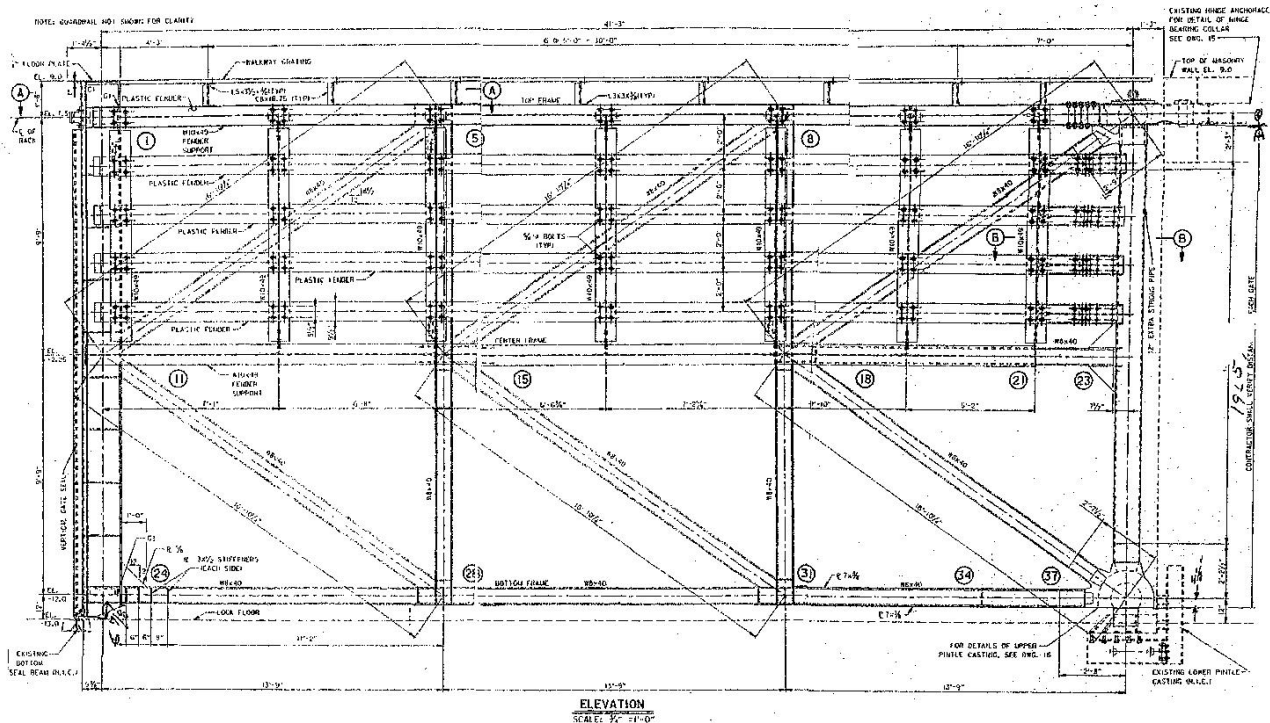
Elevation view of sector gate details (typical), Calcasieu Lock
